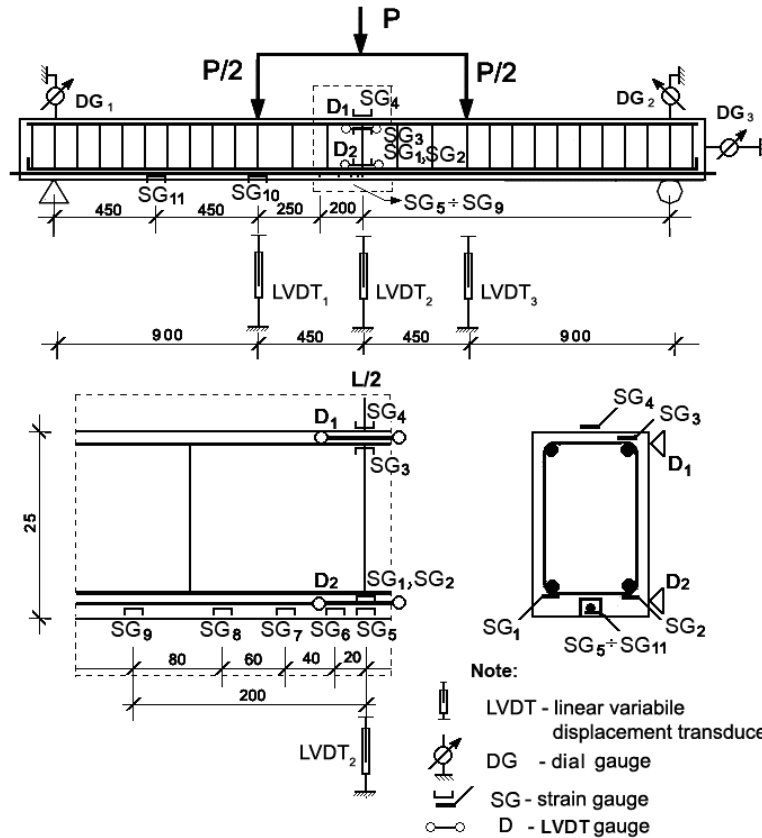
Arrangement of instruments for tested strengthened RC beams / Poziționarea instrumentelor de achiziție date pentru grinda de beton armat consolidată.
